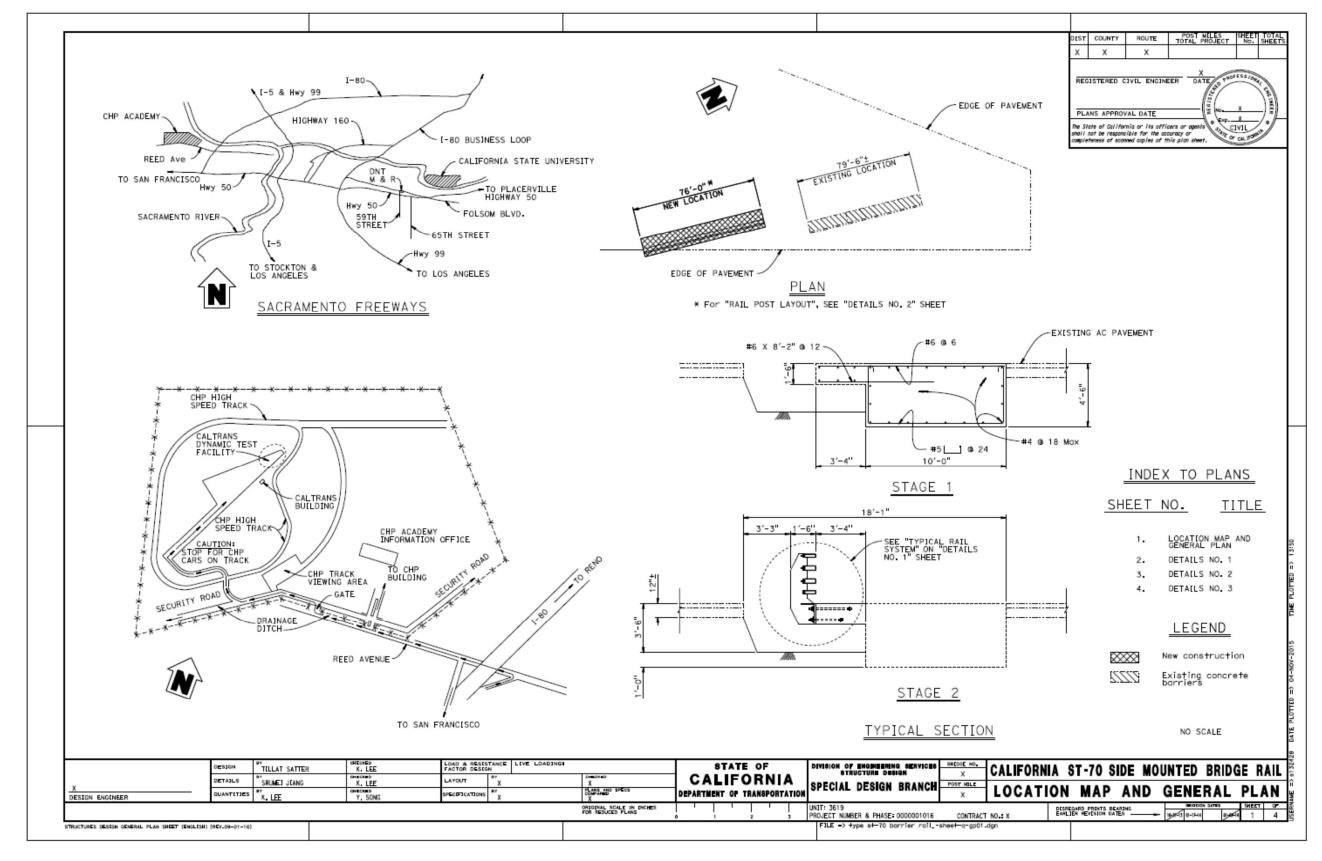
CA ST-70SM Side Mounted Bridge Rail (Title Page)
